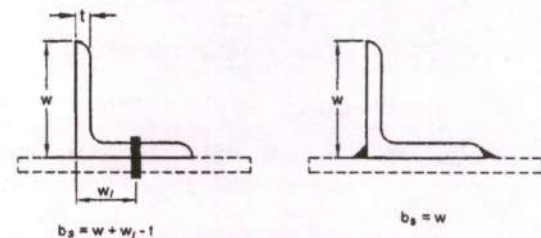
ANGLES WITH SINGLE LEG CONNECTIONS
